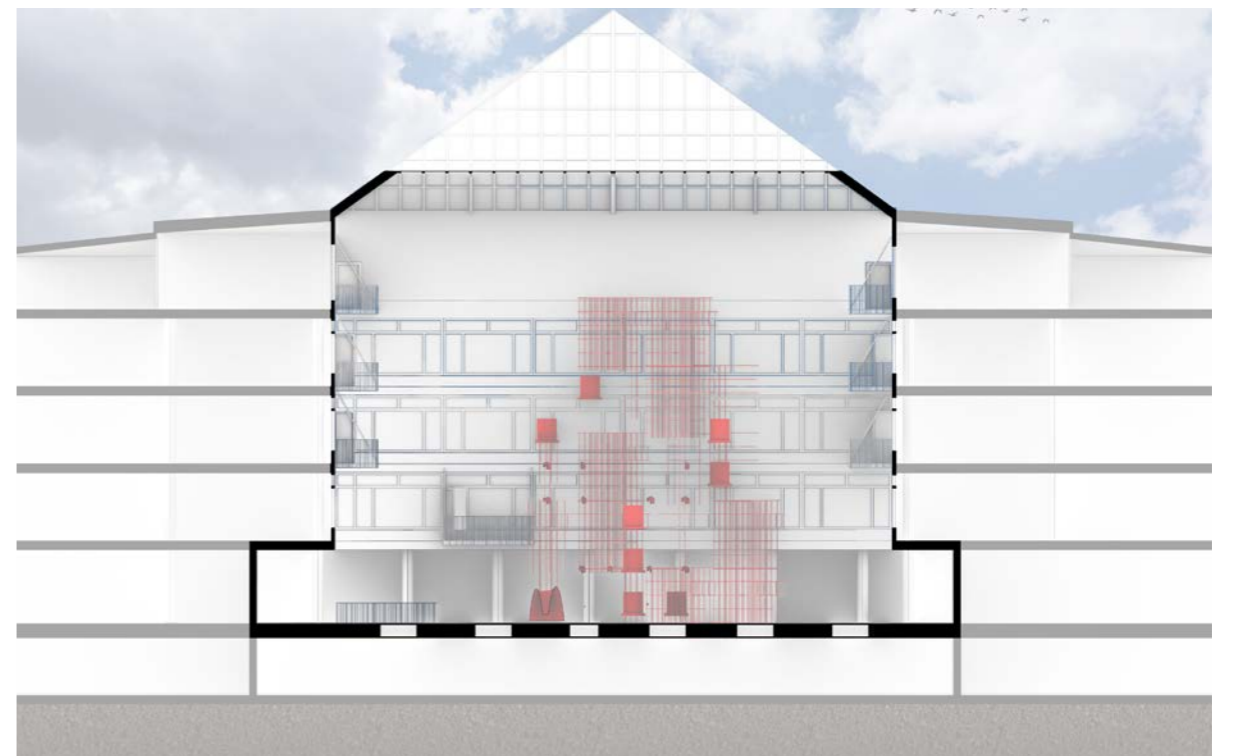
North elevation DD of Installation two and the atrium 1:350 0 4 8 12 16 20m
